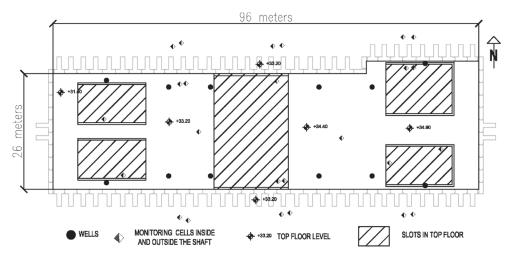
Monitoring plan of TBM Malatesta Shaft.
